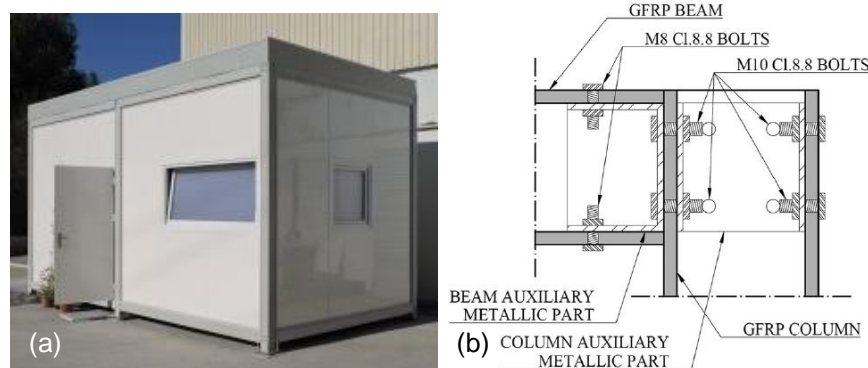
The *ClickHouse* modular building: (a) overview (image courtesy of Prof. João Ramôa Correia) [45]; (b) connection details (with permission from Elsevier) [47].
